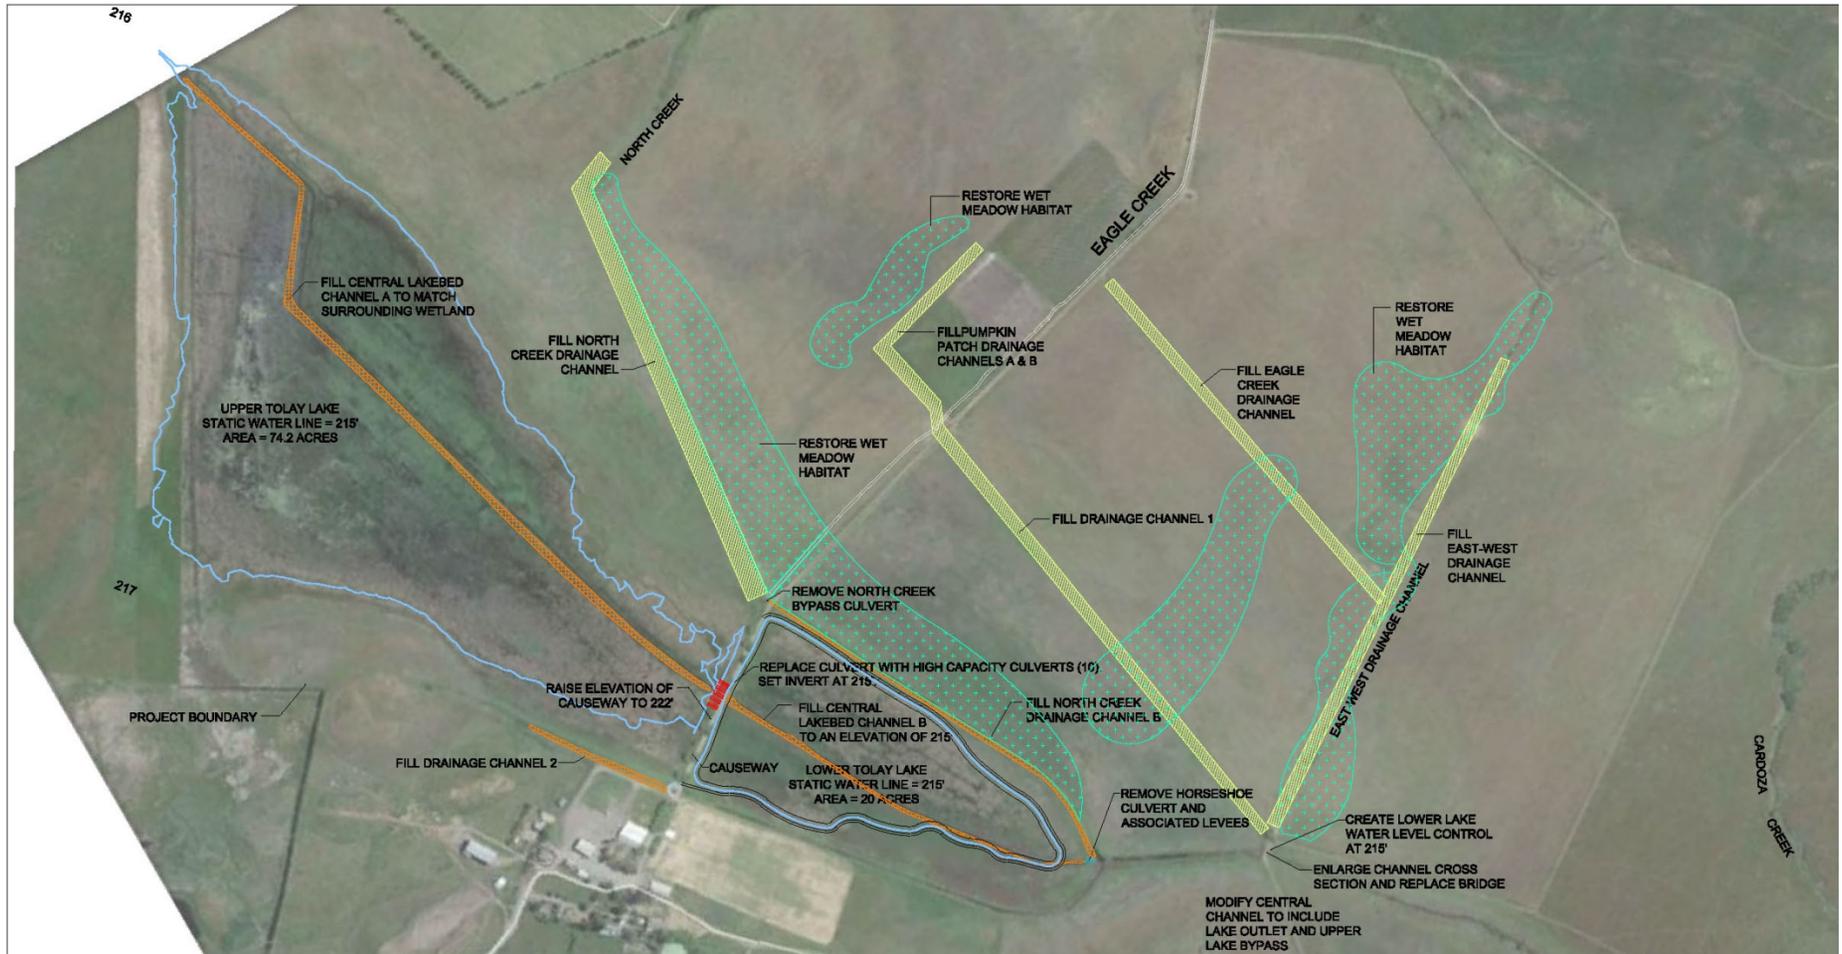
Conceptual design for lake restoration Alternative 5 – Lake Outlet at Elevation 215’ with Enhanced Southeast Basin.
